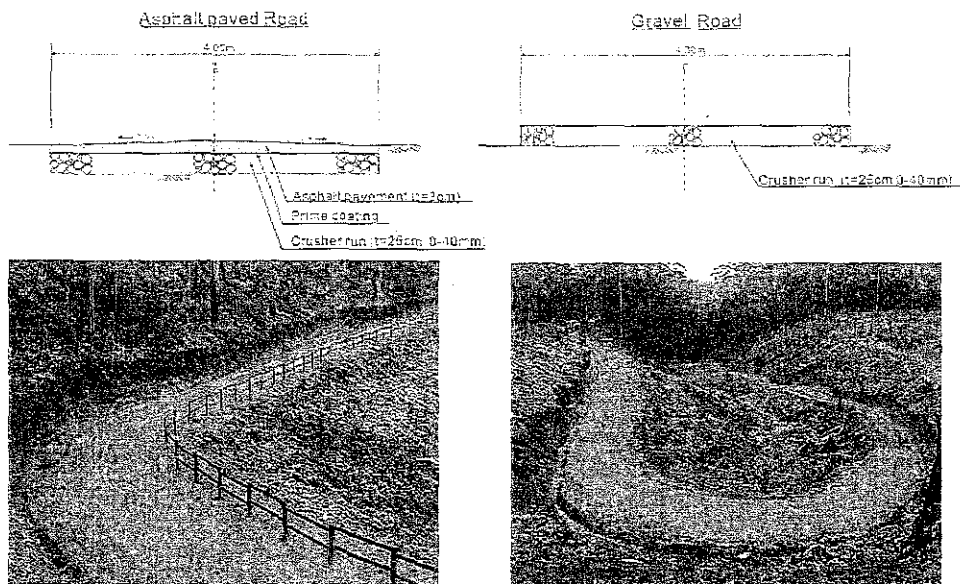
Typical Cross Section and Image Photo of Access Road
